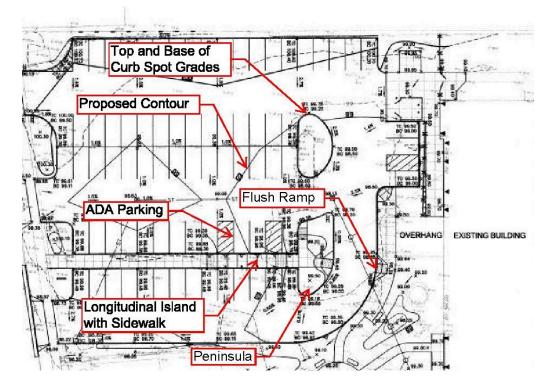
(Sample Site Plan with Some Problem Areas Noted)
